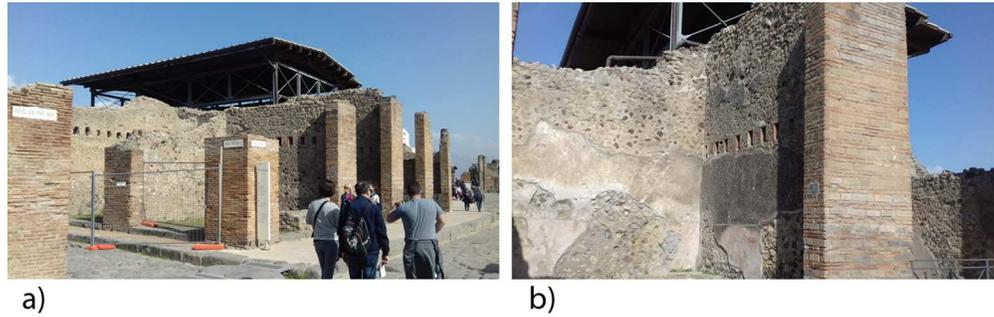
a) Blocks of the shops at the corner between the Abbondanza Street and the Lupanare Alley; b) shops next to the destrictarium block and detail of the holes in the walls for the frames which supported the timber floor of the dwellings on the upper floor
